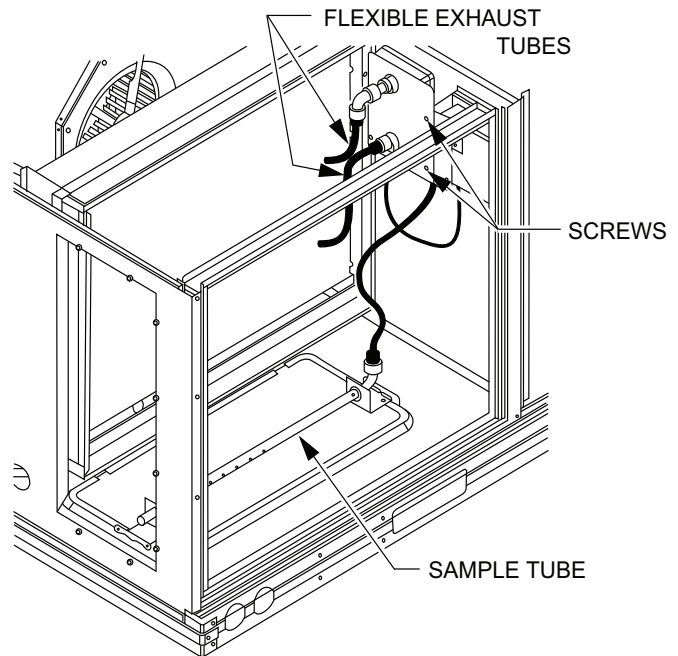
Return Air Sampling Tube Location (View reoriented to show opposite side for clarity)
